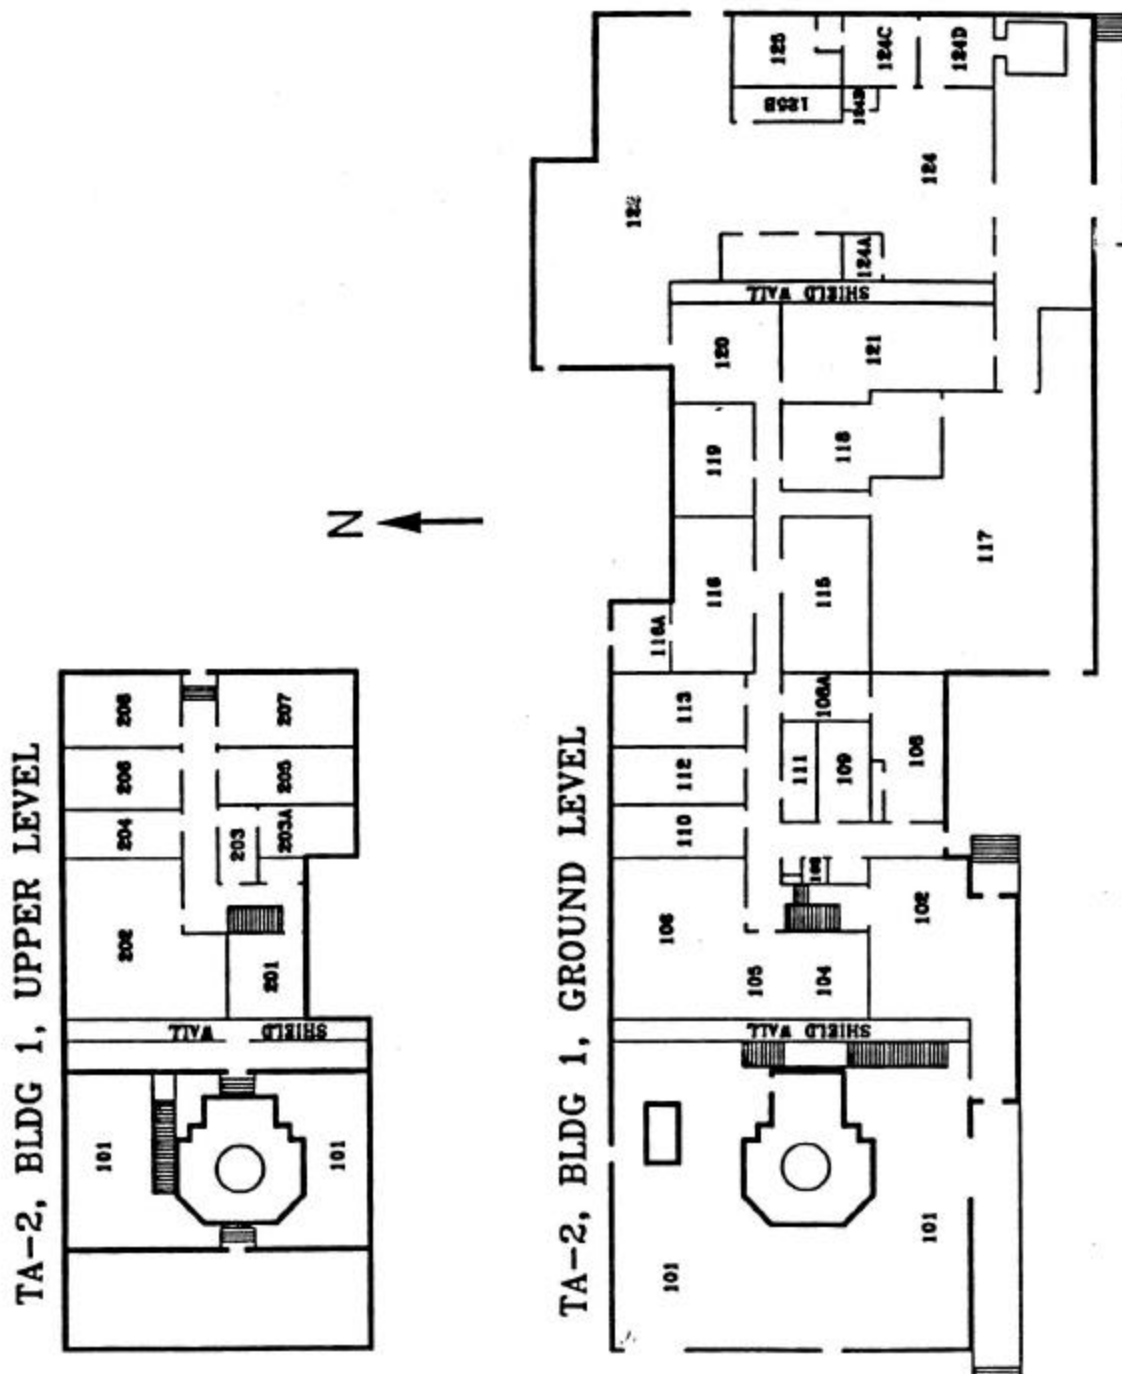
First and Second Floorplans of Omega West Building 2-1.
